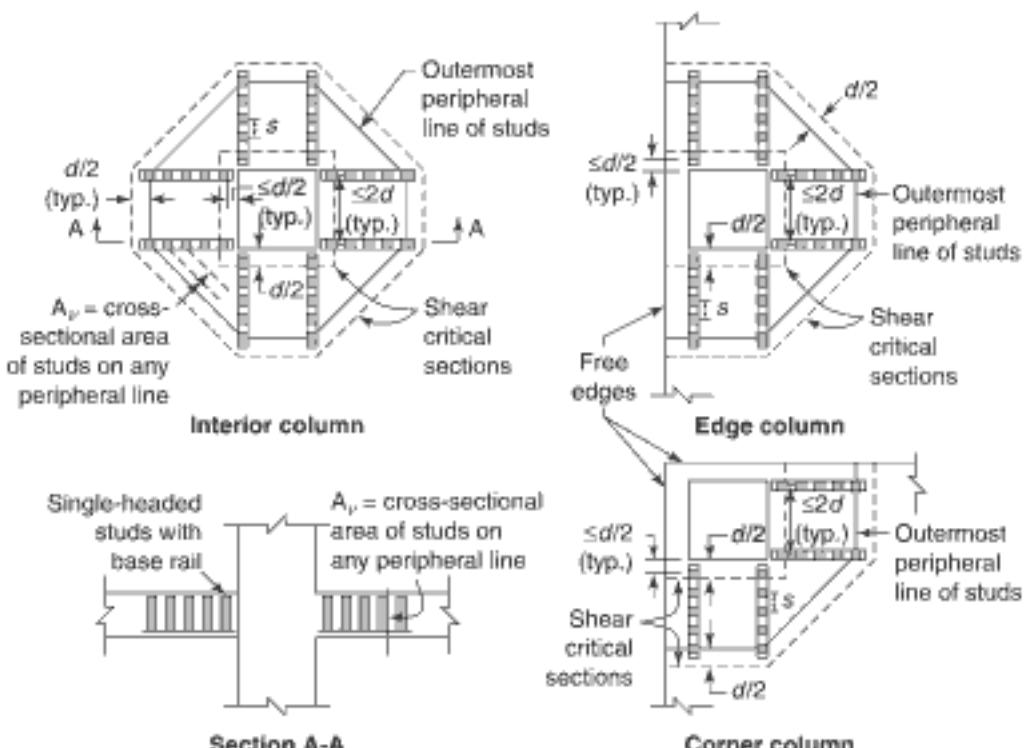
Typical Arrangement of Headed Shear Stud Reinforcement (Ref. 11.1).
